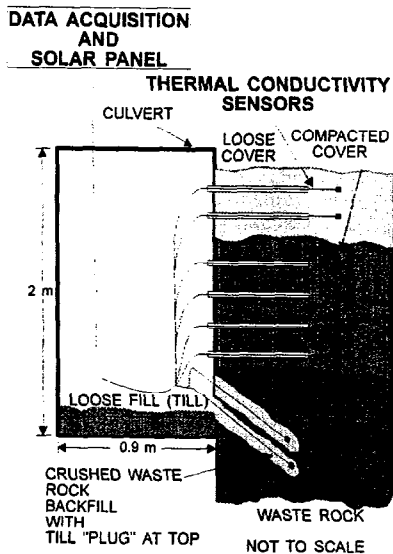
Cross-section of the instrumentation station and sensor installations for Site I (after O’Kane, 1995).
